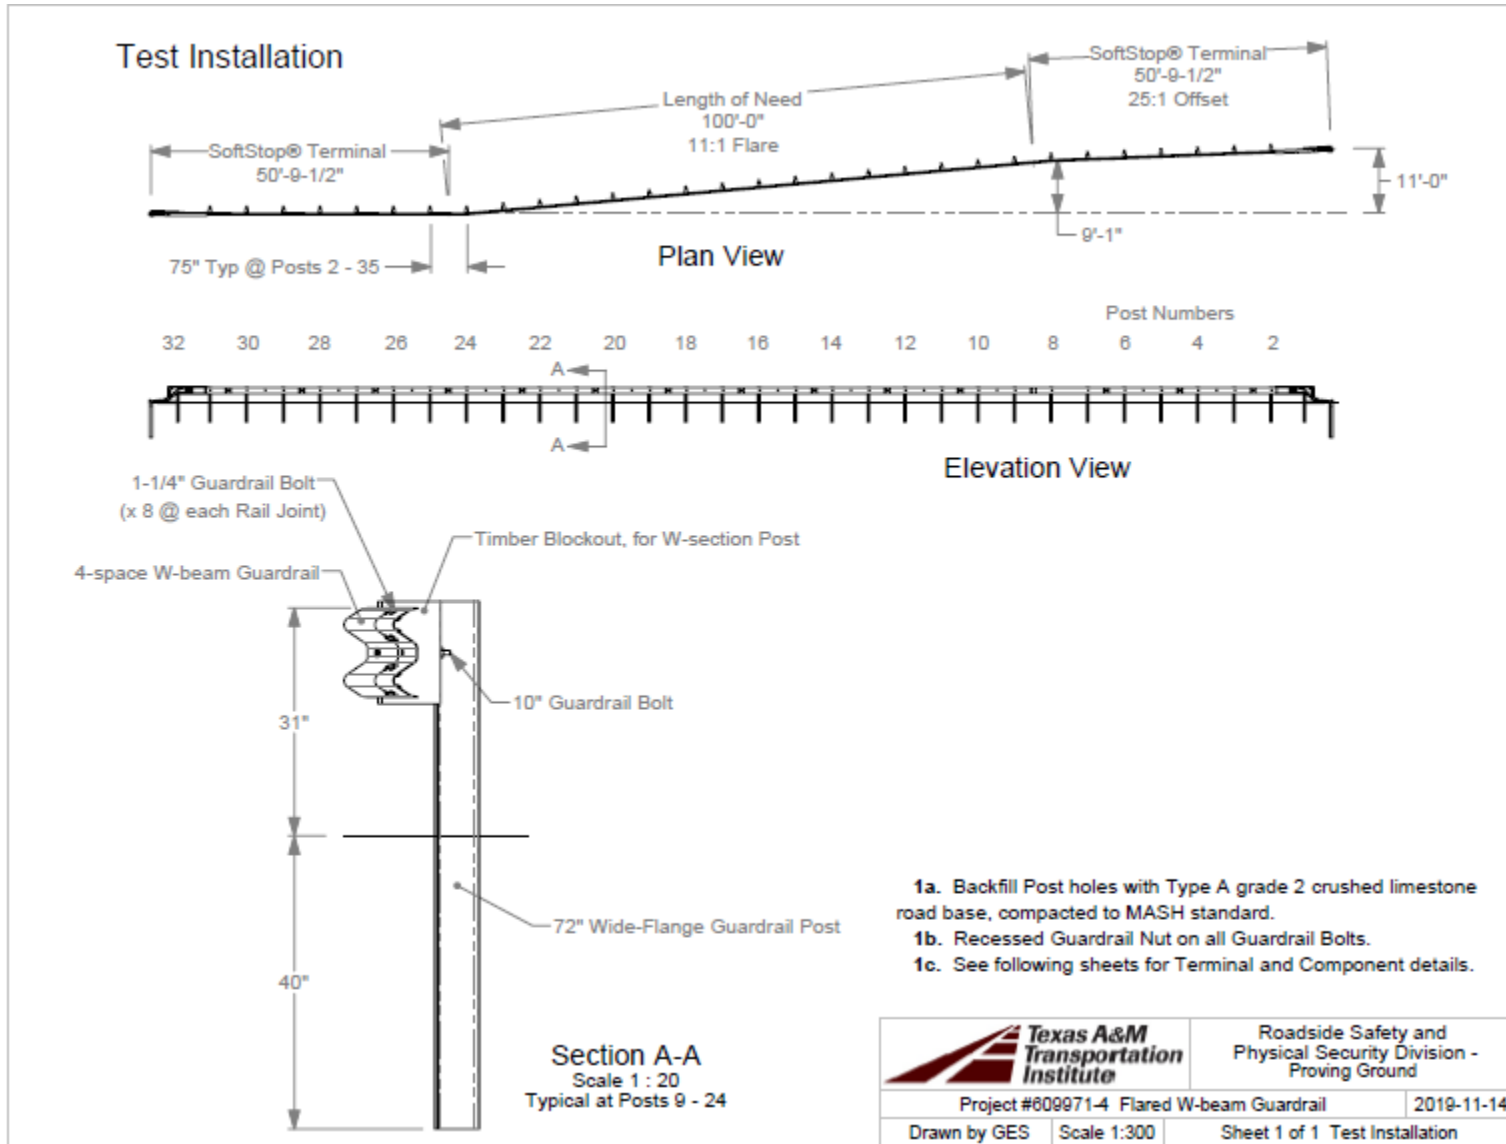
Details of MGS Guardrail with Reduced-Length 11:1 Flare.
